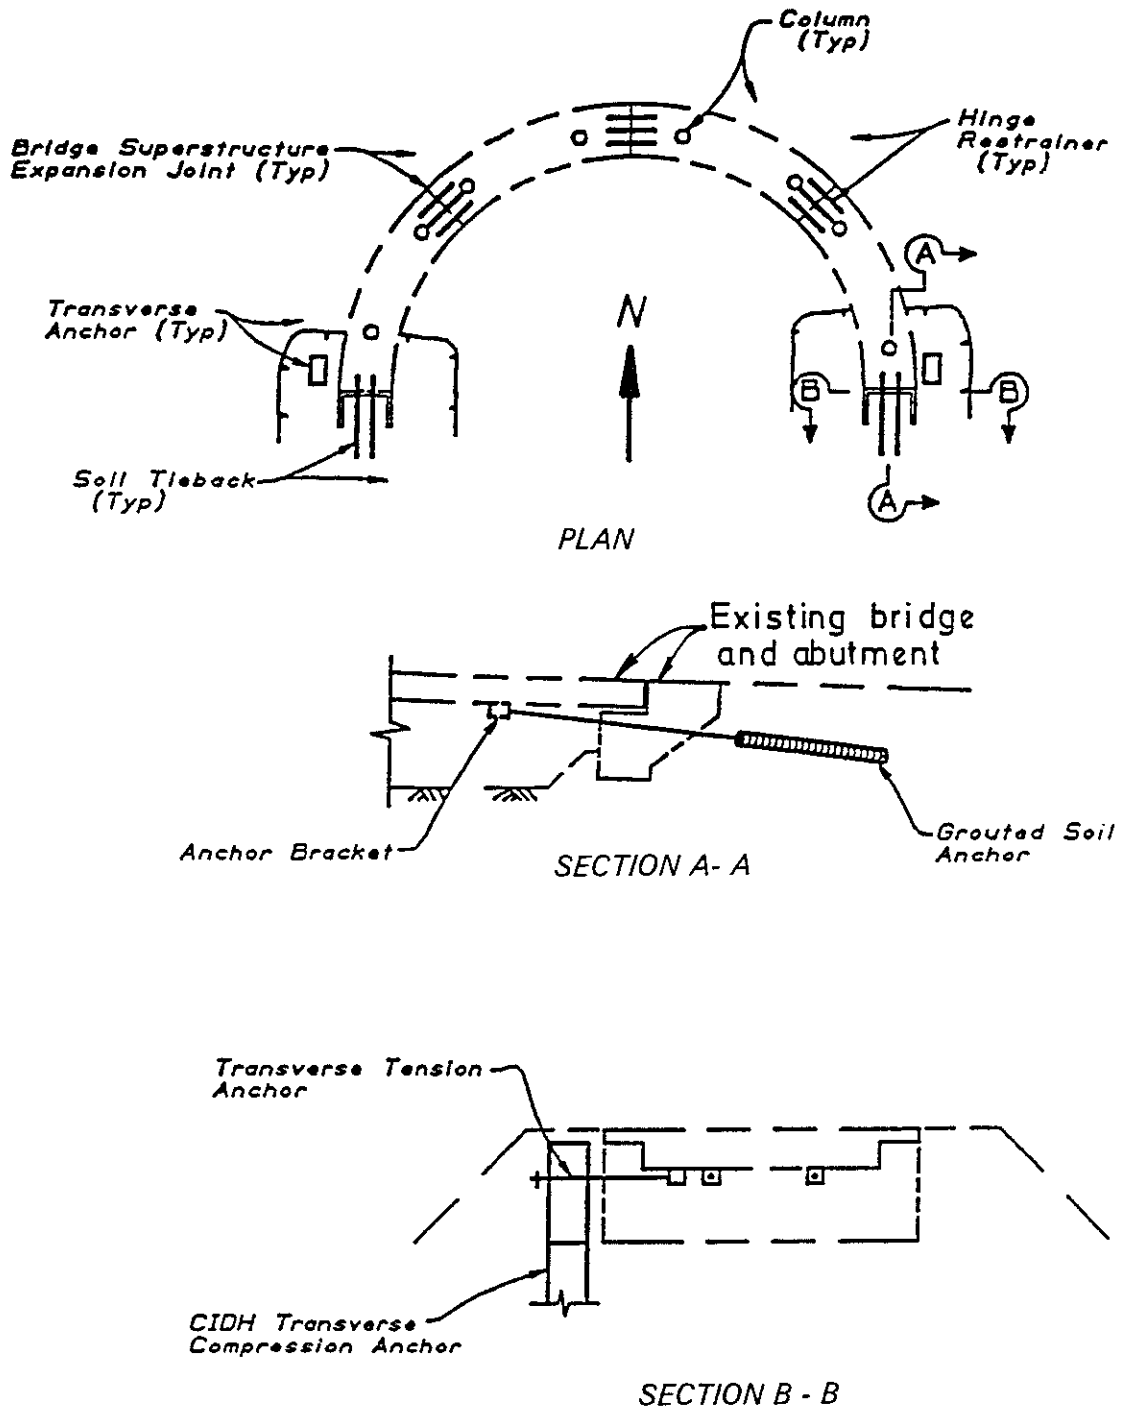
Retrofit of a curved bridge using movement joint restrainers, abutment tension tiebacks, and concrete piles for the transverse anchoring of the abutment (Caltrans 1992).
